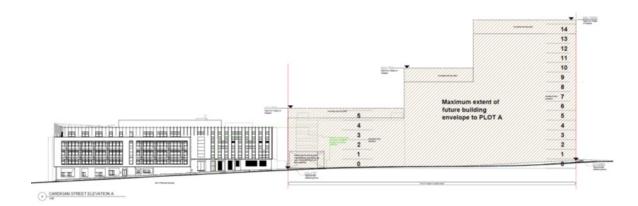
Maximum extent of building on Plot A as viewed from Cardigan Street
